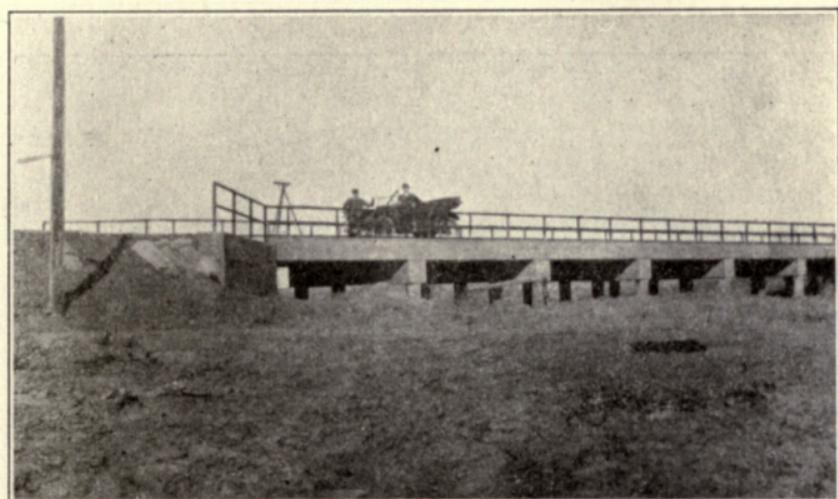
Concrete pile, cap and slab bridge over Bijou Creek, Colorado.
